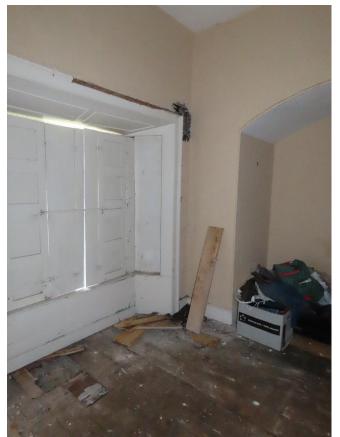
section of plaster removed for architectural investigations in centre front bedroom. The pile of bat droppings are visible on the floor under the opening
